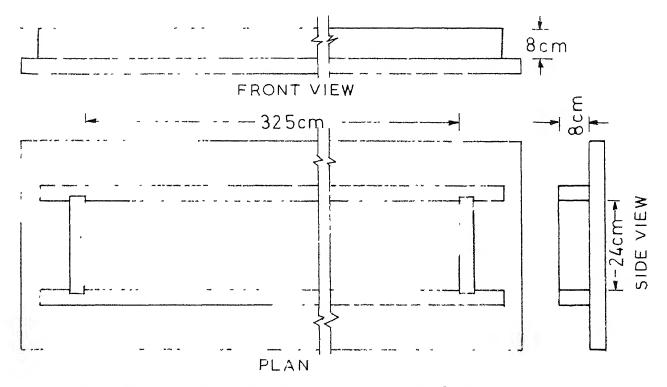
1(a) Mould for casting R.C. beams (Compressive loading)
